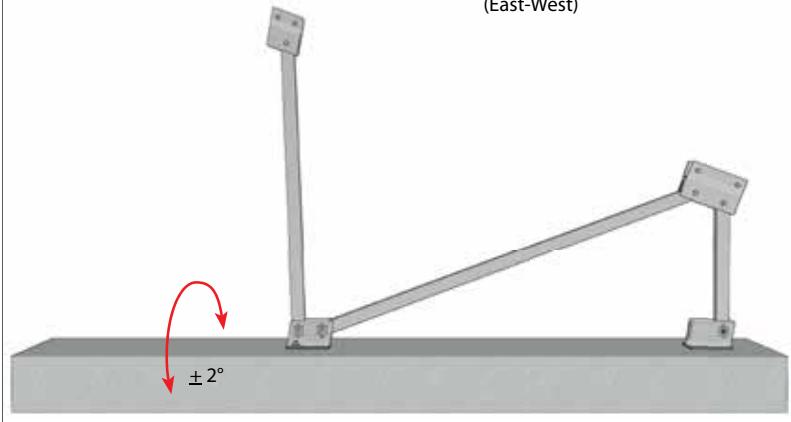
2 (east-west tilt of the concrete foundation)
